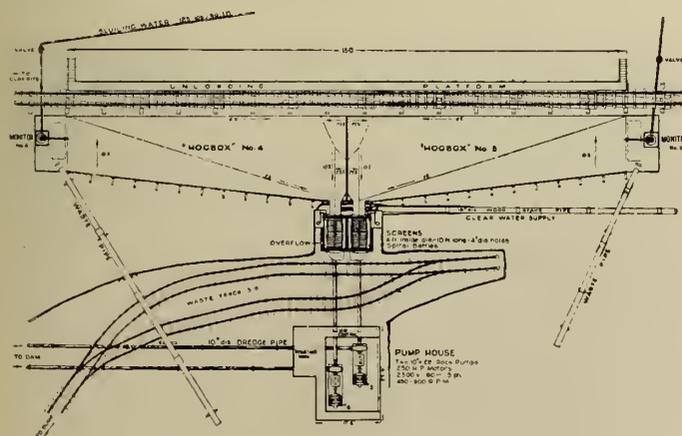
Hydraulic Fill Plant—South Unit.
